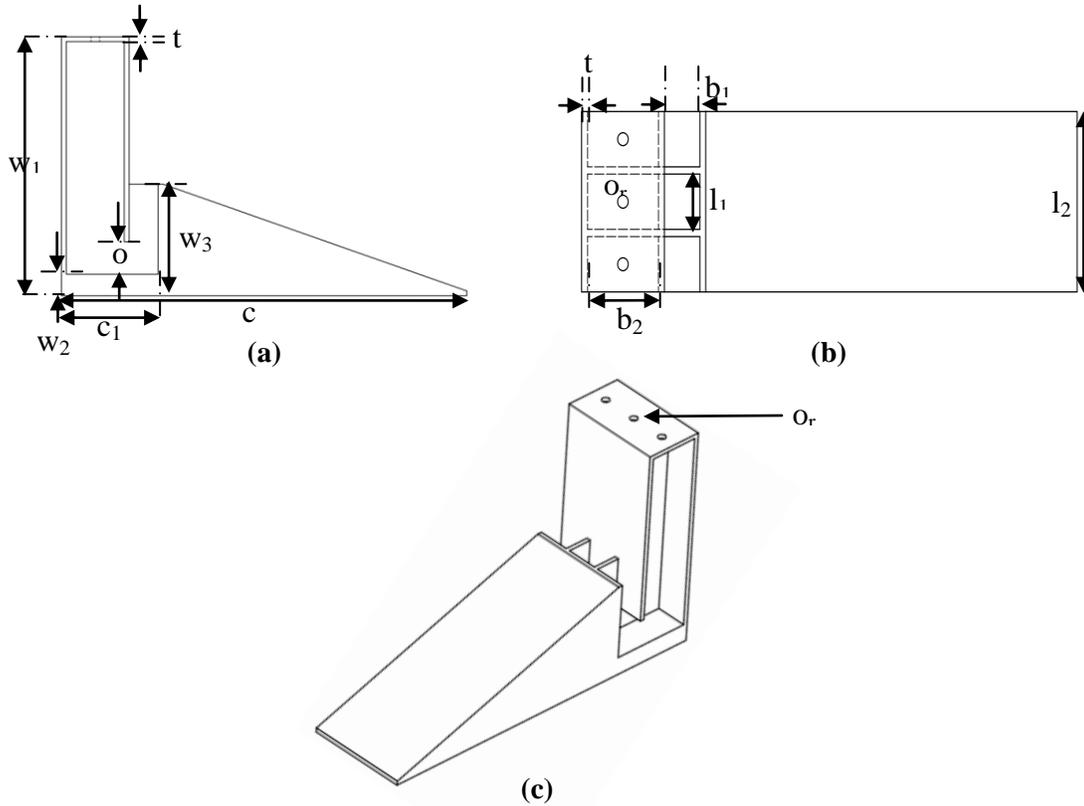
(a) Side view (b) plan view and (c) 3D perspective view of the U-OWC model [11].
